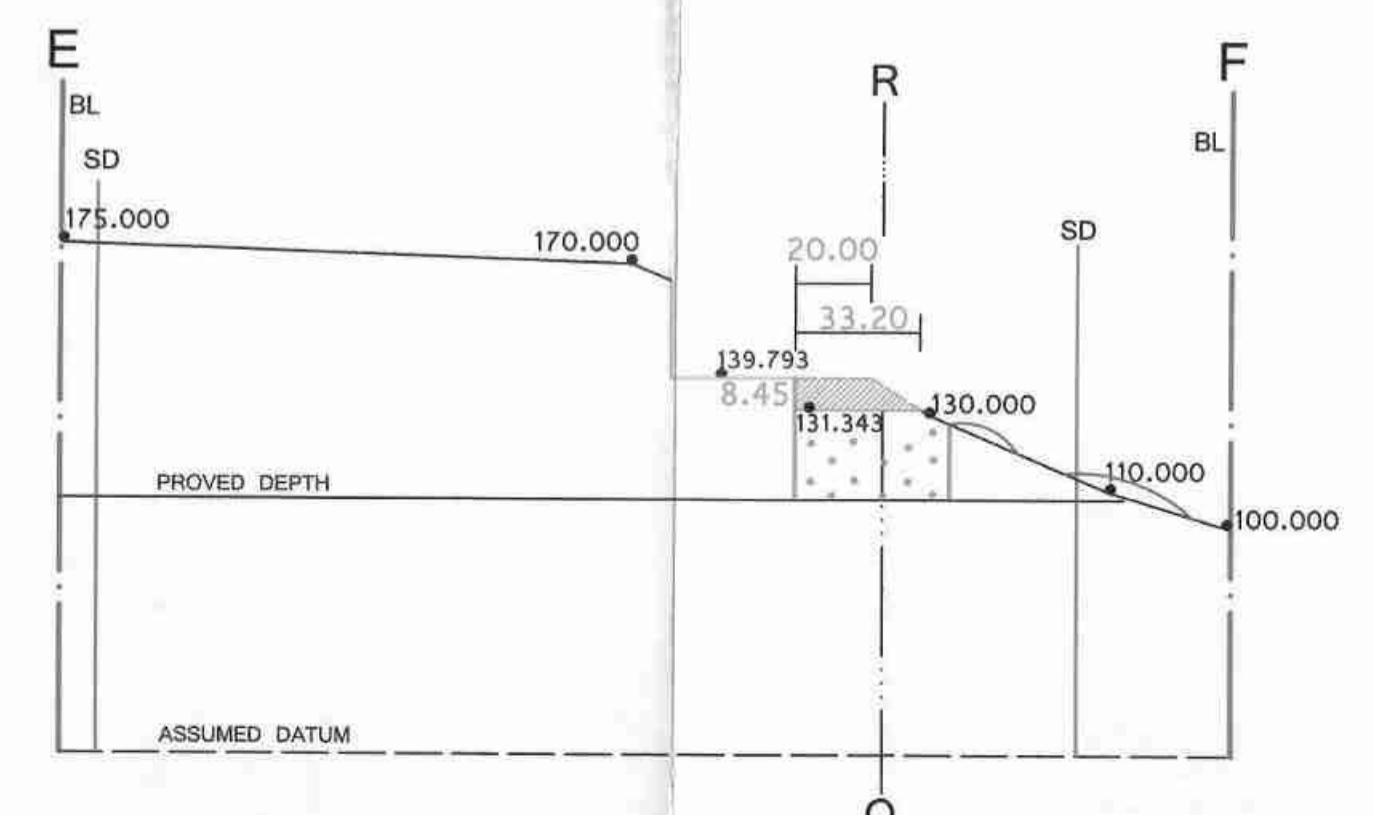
DETAILS OF DEPTH, BENCH AND PRODUCTION FOR MINING PLAN PERIOD
